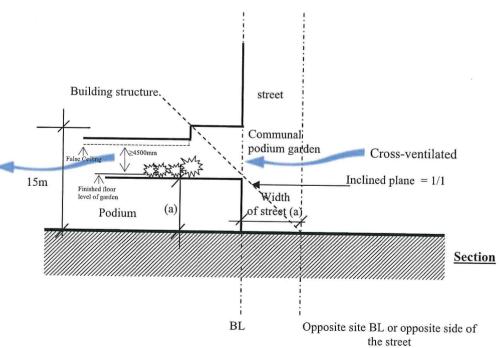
Stepped building profile with communal podium garden as detailed in paragraph 7(b)
